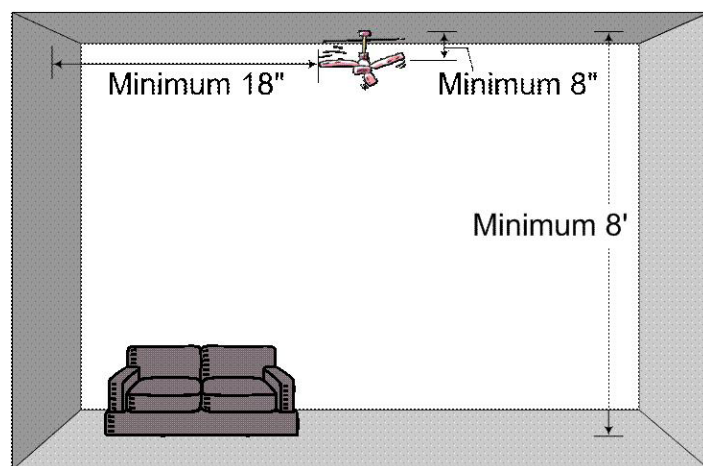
Minimum space requirements for a ceiling fan installation recommended by the U.S. Department of Energy.
